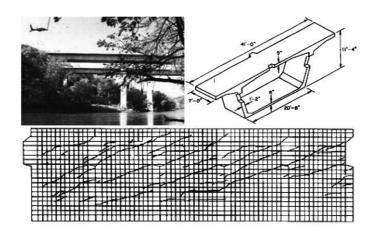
Shear cracks on the webs of Southbound Kishwaukee Bridge
